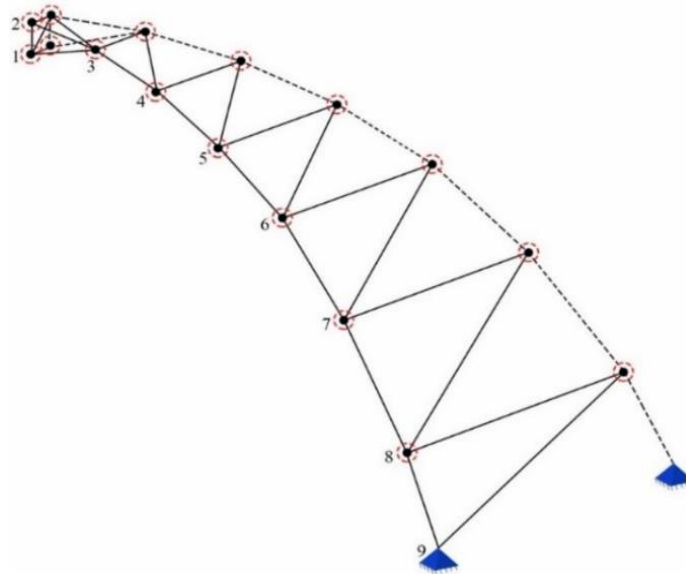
Details of a sub-structure of the 600-bar single-layer dome
